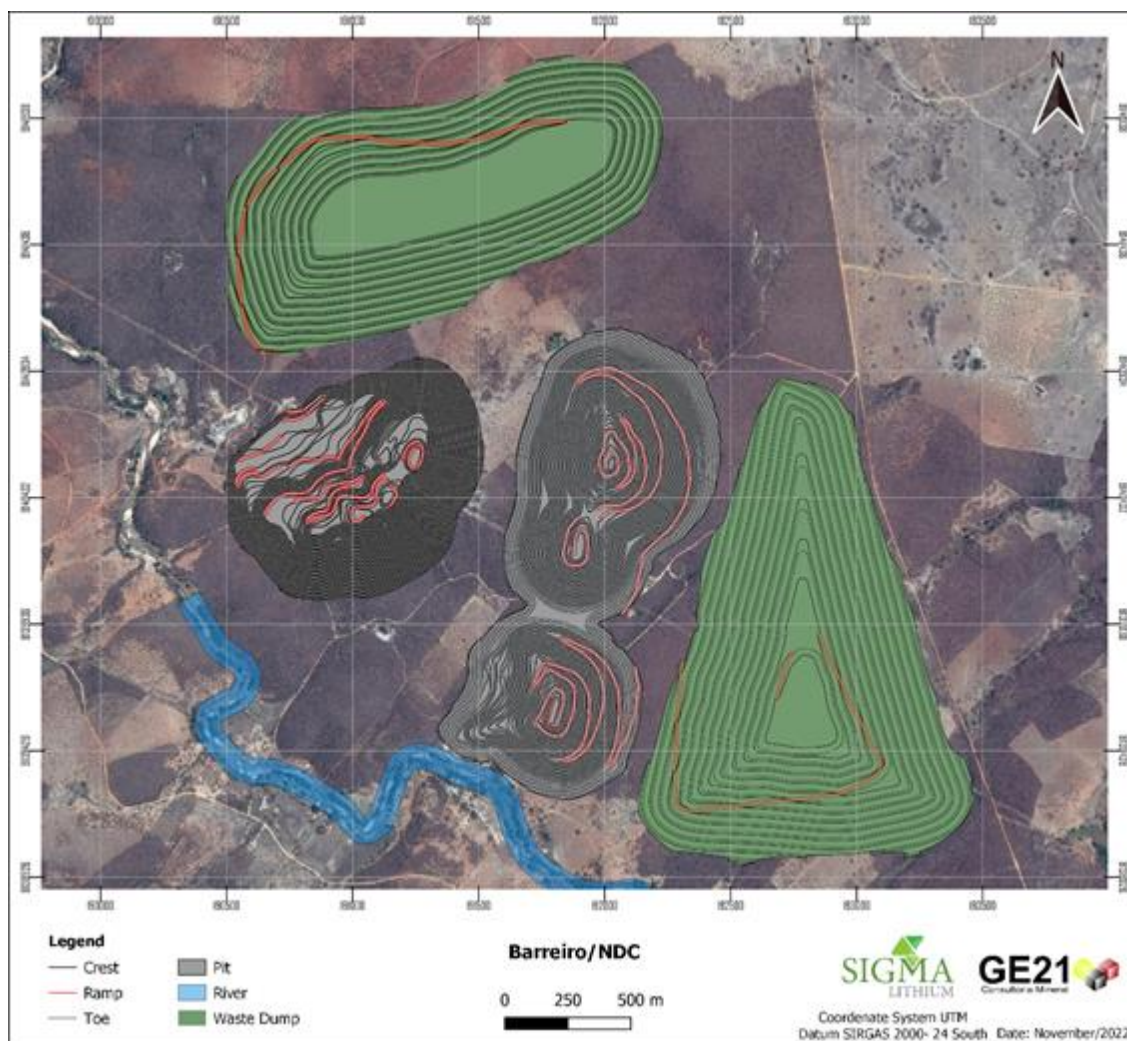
Barreiro and NDC pit and waste dump arrangement in relation to Piauí River
